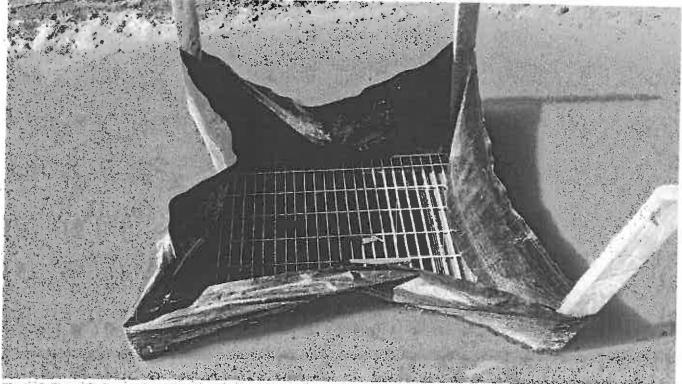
Stormdrain requires Atgrade inlet protection at the new Tennis Court.
